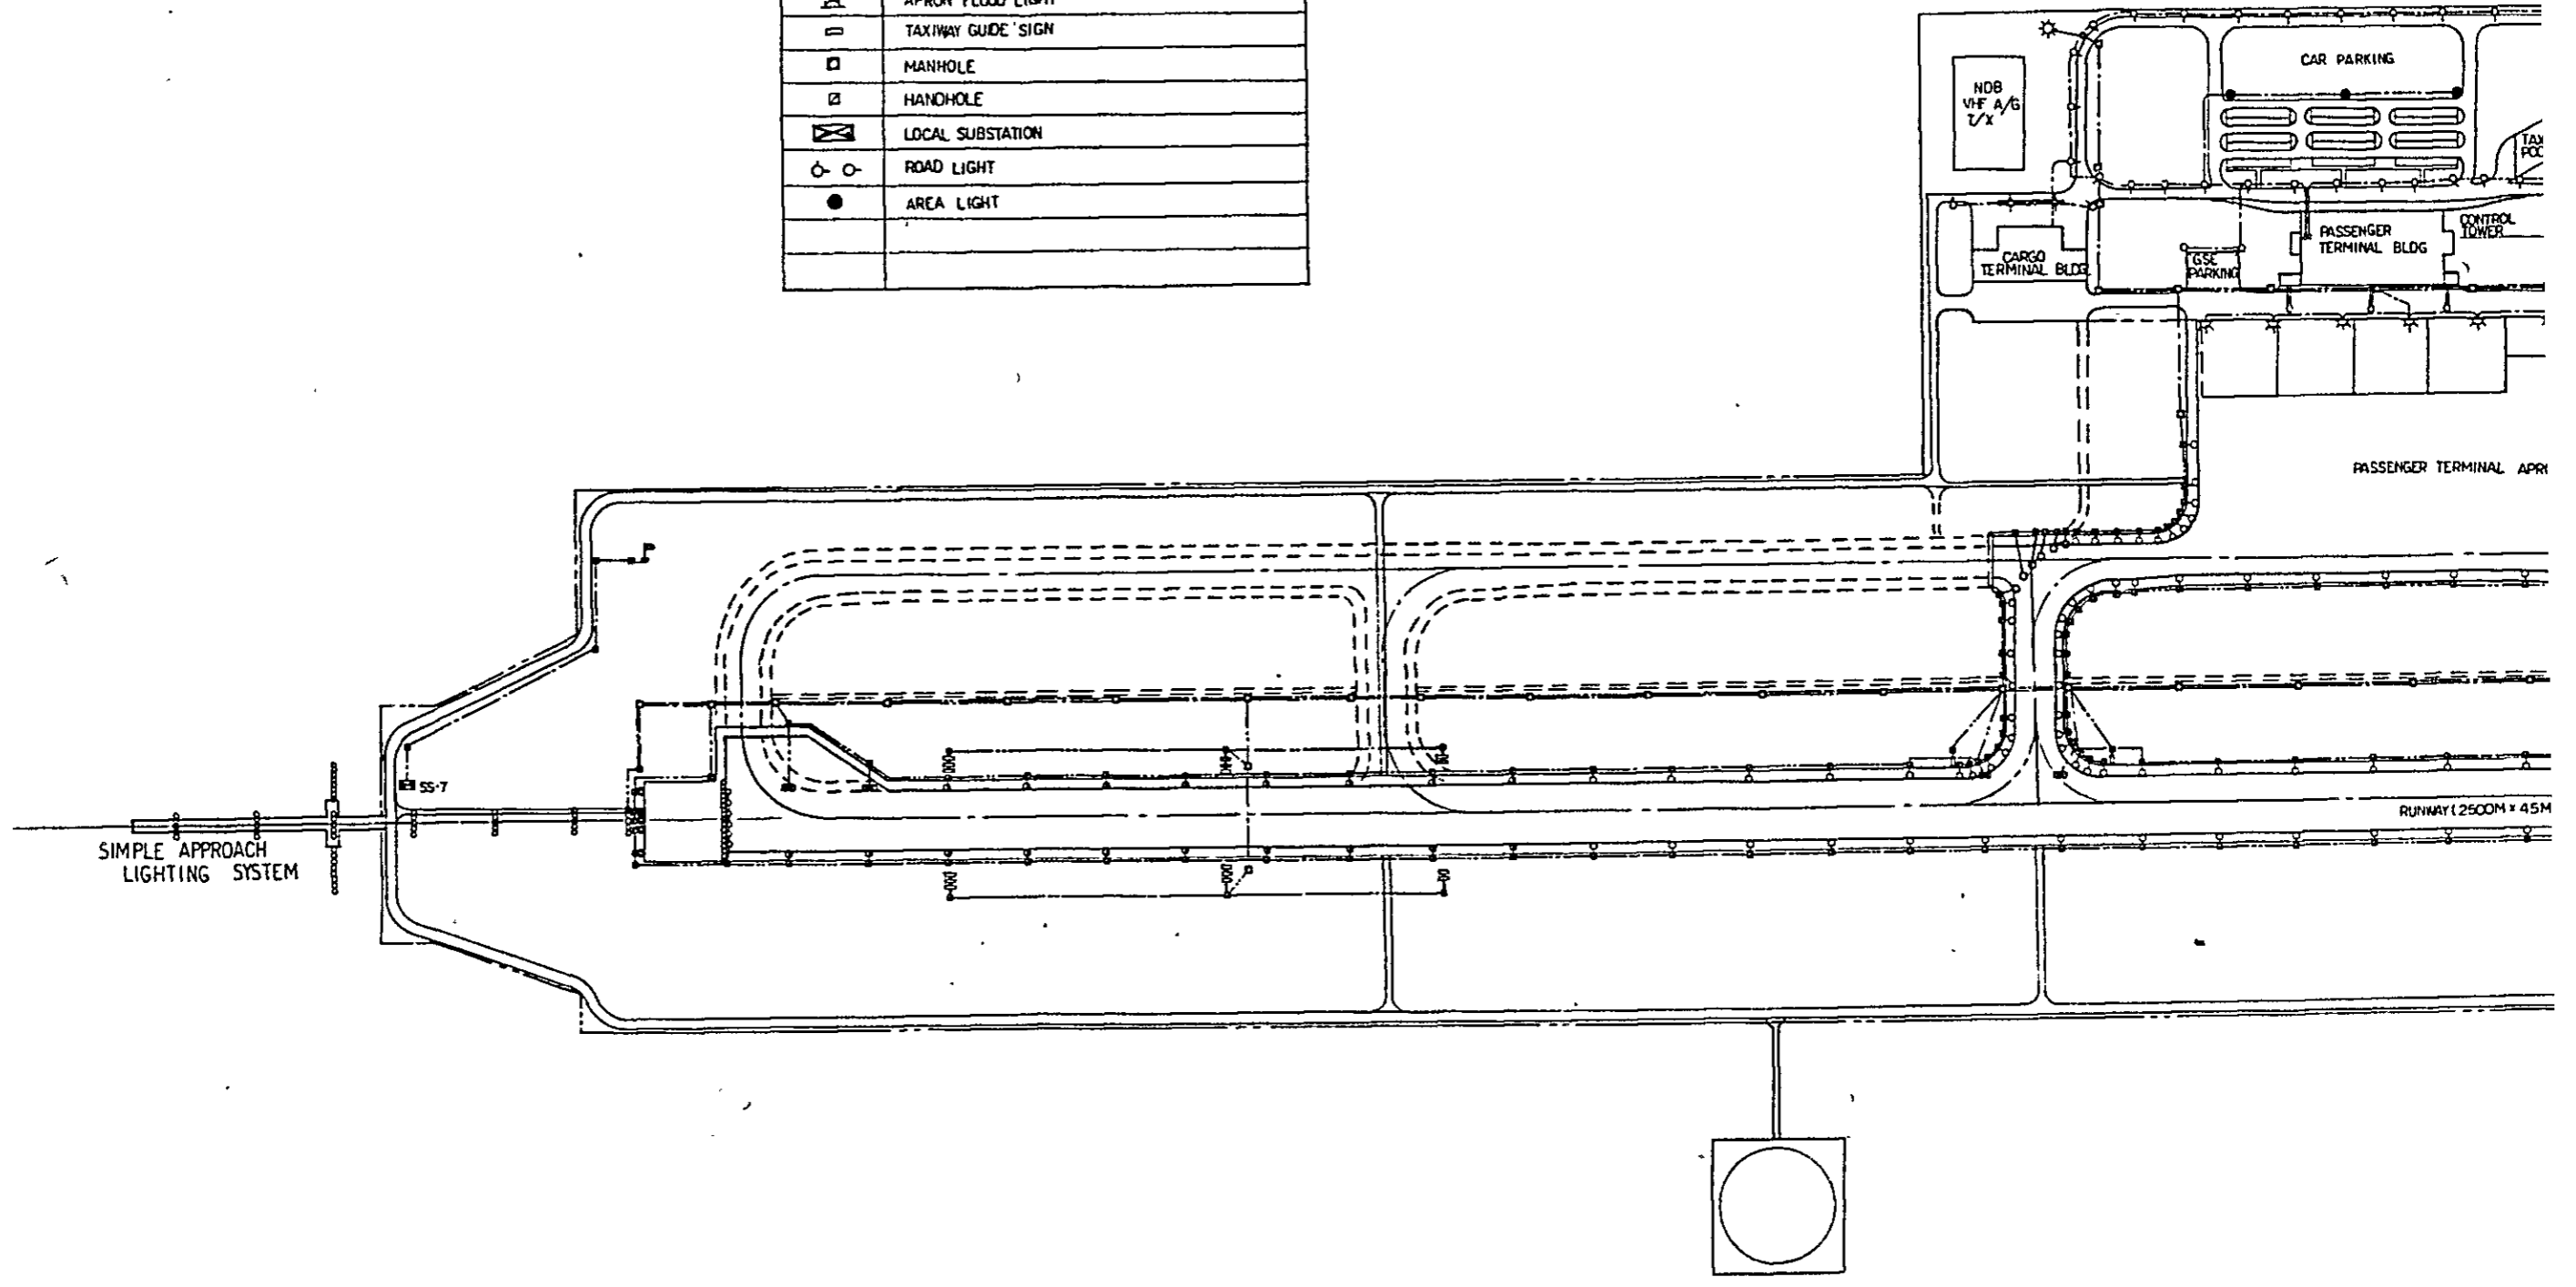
AIR NAVIGATION SYSTEMS LAYOUT PLAN
